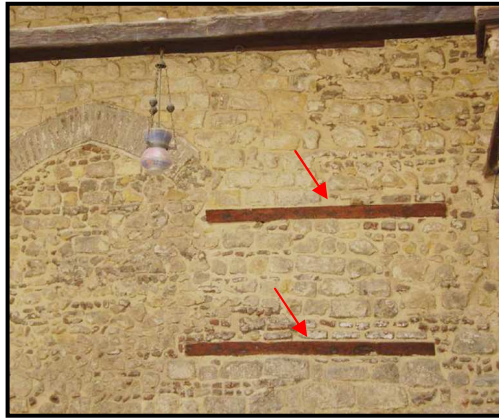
Restoration of interior façade wall following case 'a' of previous typical detail, Mosque of *Jānbulāt*, 1797A.D., in Cairo.
